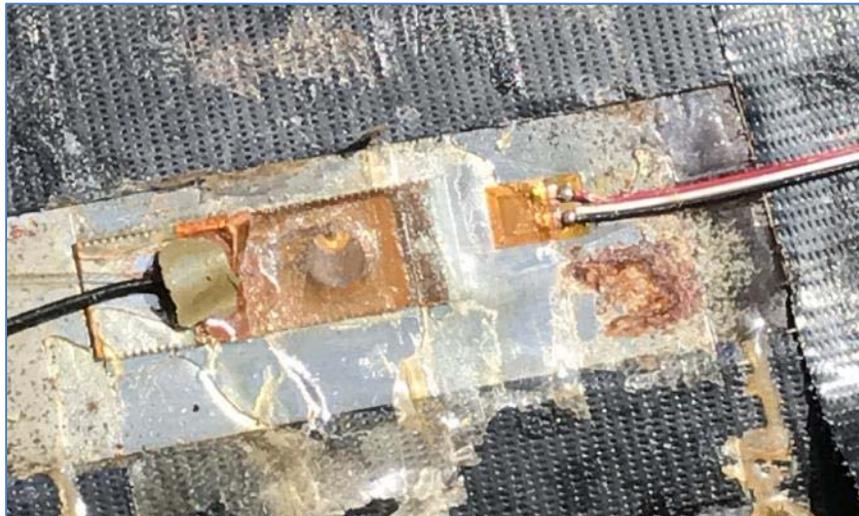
Vibration Sensor and Strain Gauge epoxy bonded to pipe
